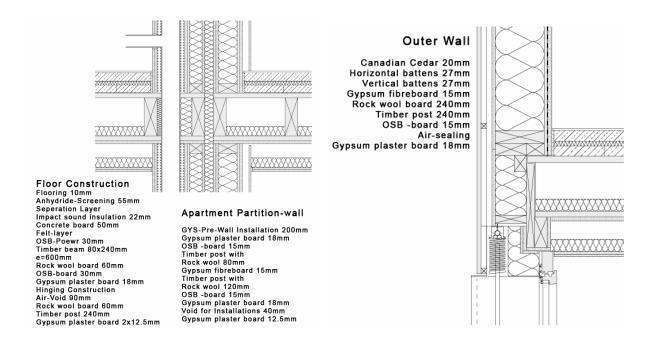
c – Apartment Partition wall detail; Dimensions in [mm] [mm]
